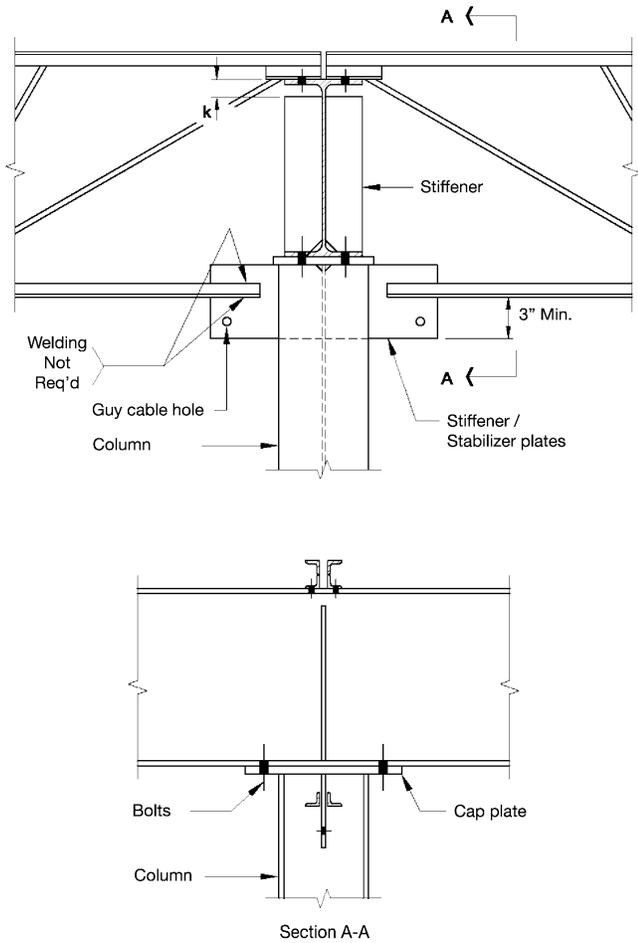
Strut joist with stiffener and stabilizer plate.
